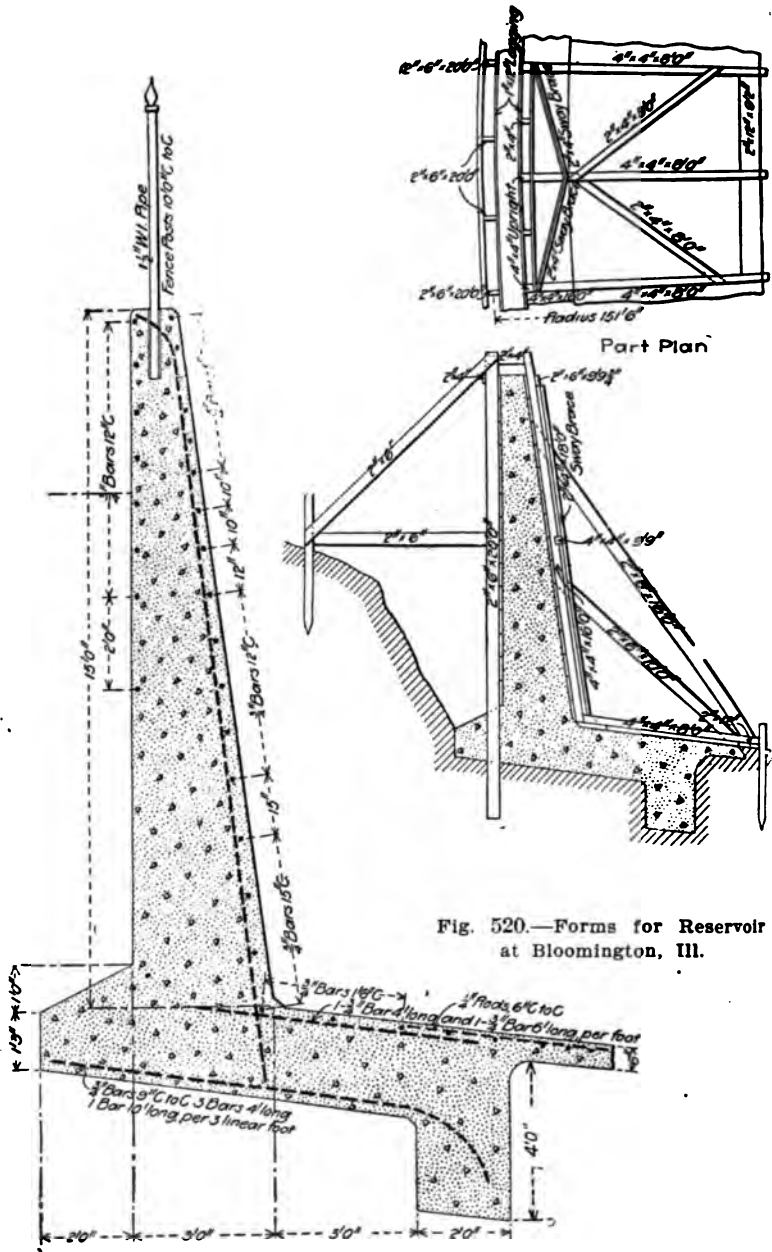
Section of Wall for Reservoir at Bloomington, Ill.
